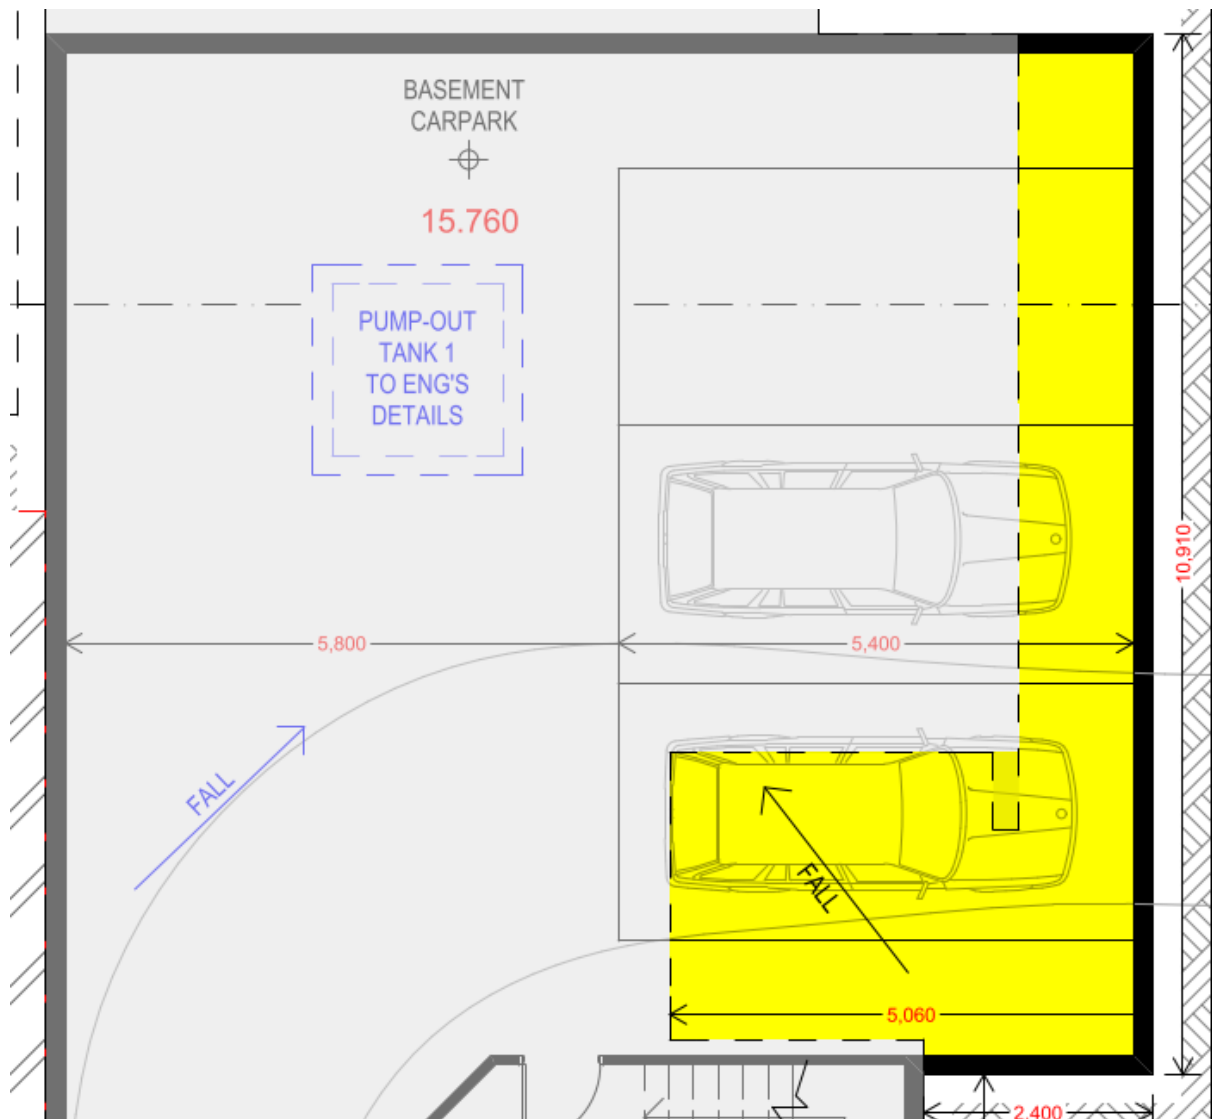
Extract of the proposed basement floor plan. Yellow shows the area that is outside the ground floor footprint.
